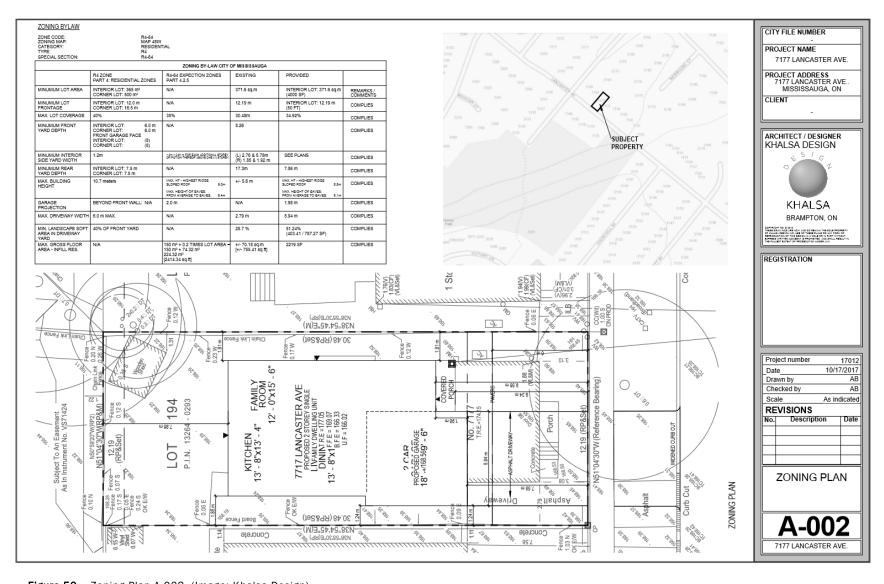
Zoning Plan A-002. (Image: Khalsa Design)
